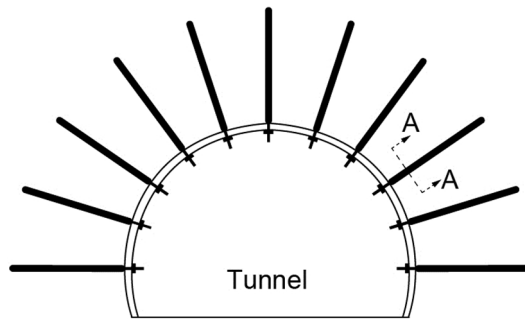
Tunnel and inflatable steel pipe rockbolt
